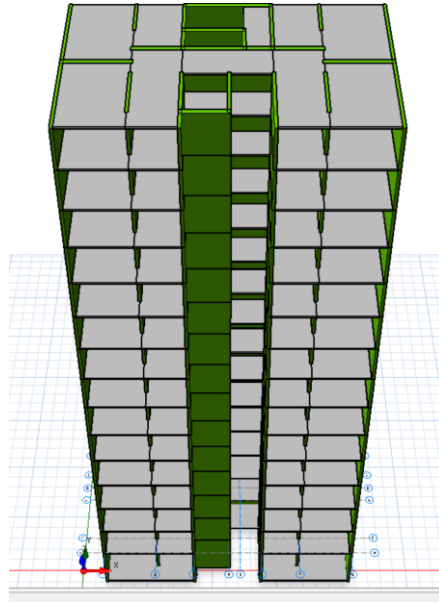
RC14 Model (Reinforced Concrete Model – 14 Floors with 1 Basement)
